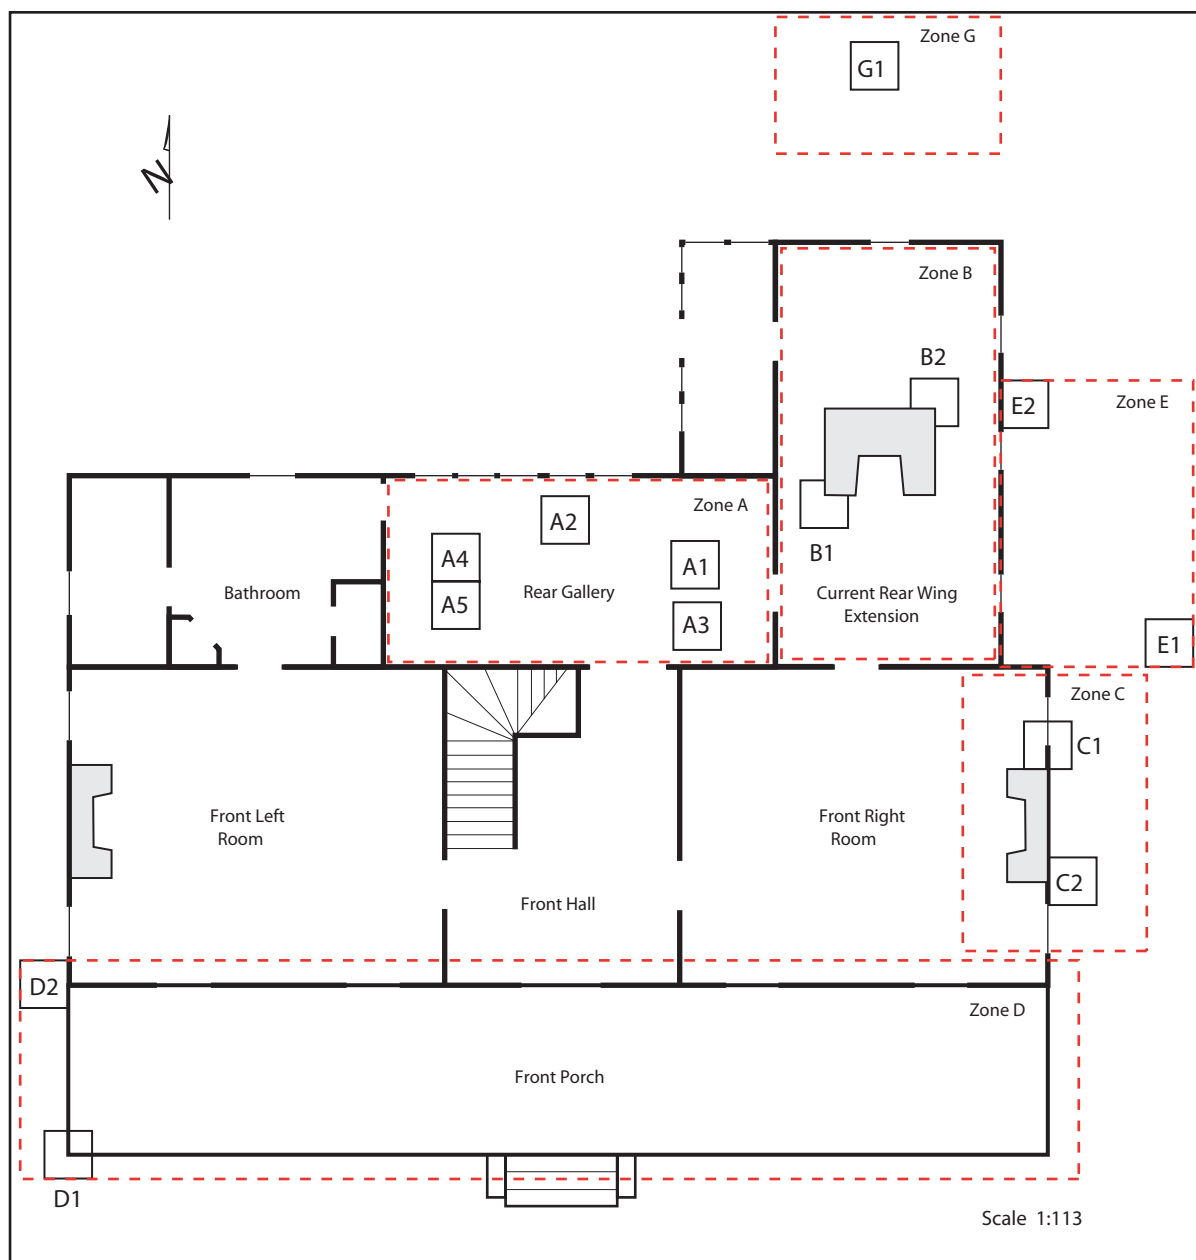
Map of the plantation house showing zones and placement of excavation units.
